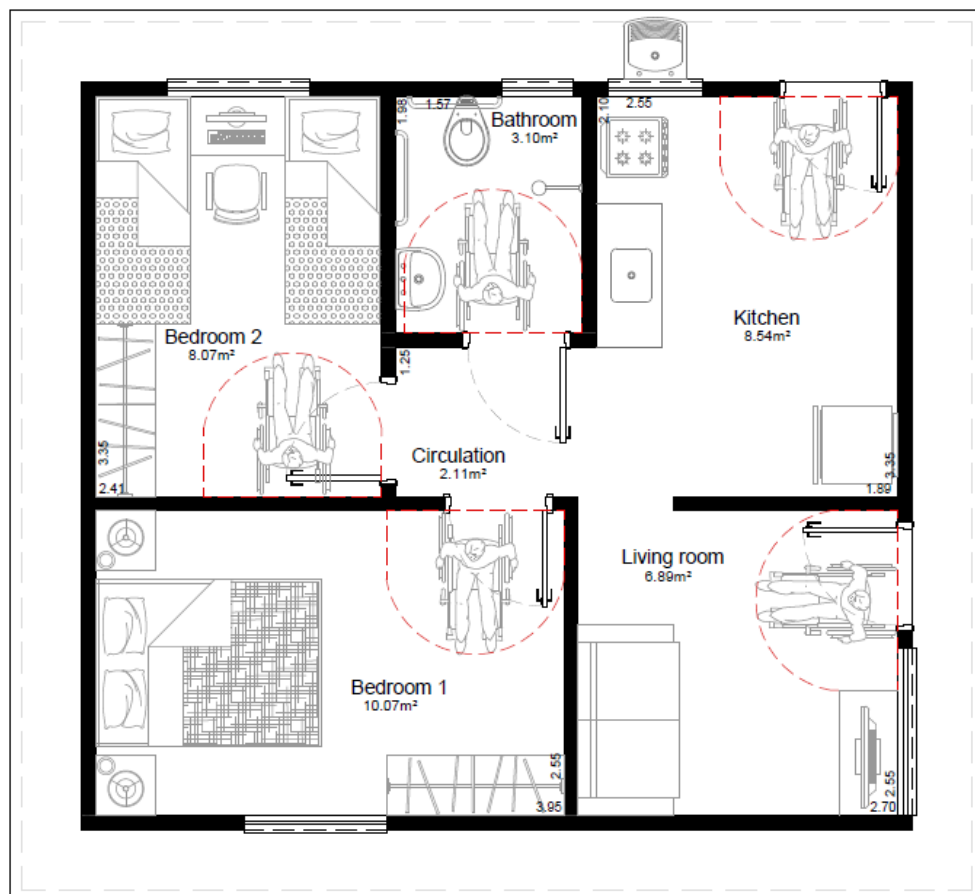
Floor plan of a house of Joao Alberto adapted for people with special needs.
